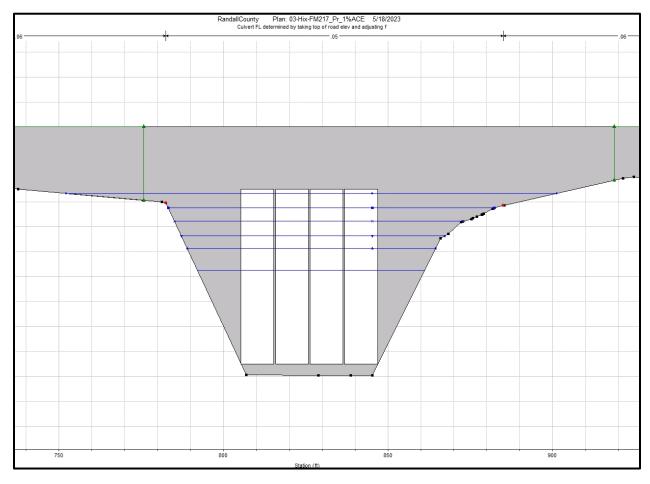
Proposed 1% LOS upstream cross section at Hix Road/FM 217 crossing of unnamed stream.
